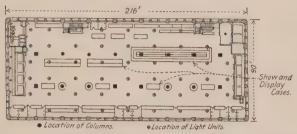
Showing typical arrangement of furniture and lighting units on the upper floors of a department store.
